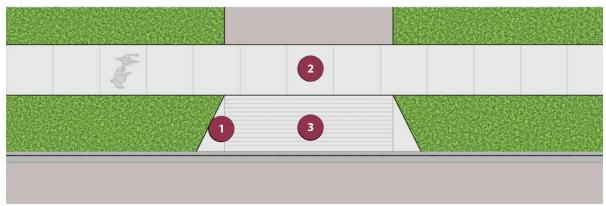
// DRIVEWAY CROSSING OF SEPARATED SIDEWALK
